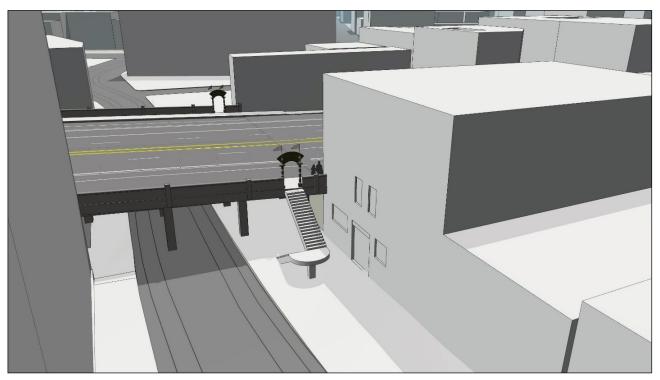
Existing pedestrian access at north side of west approach, artist's rendering, aerial view looking southwest (Fat Pencil Studio, 2021).
